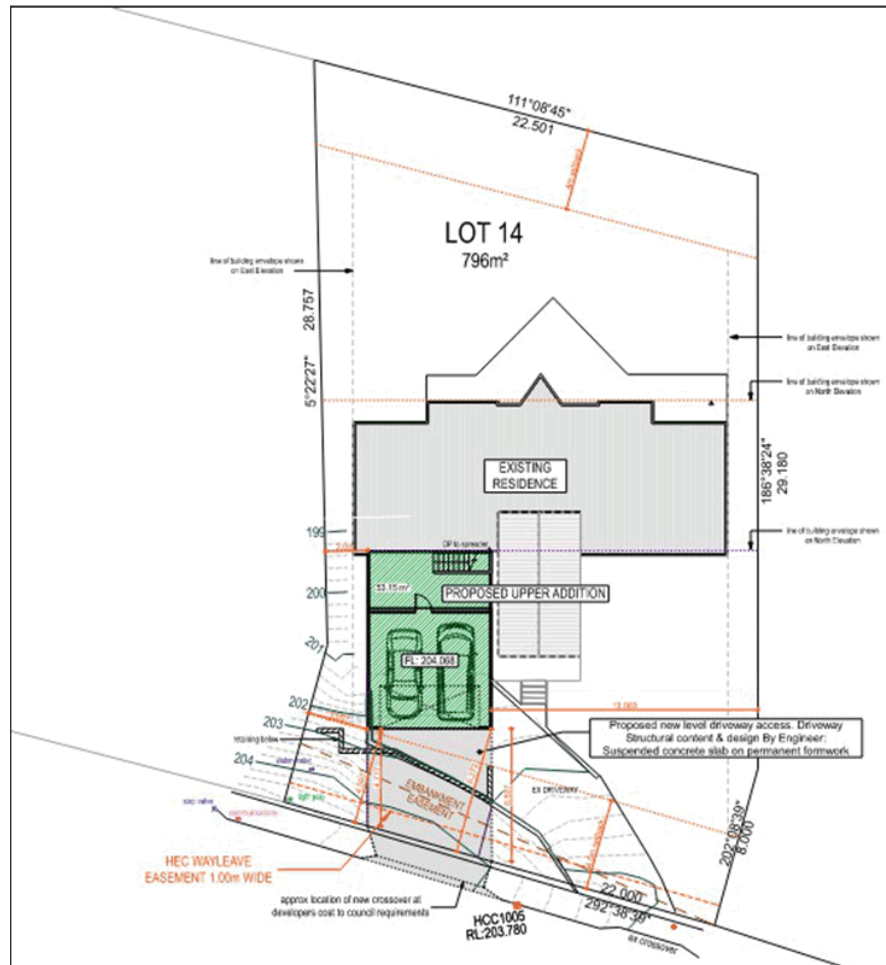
Applicant Site Plan (DuoDesigns, 2020)
